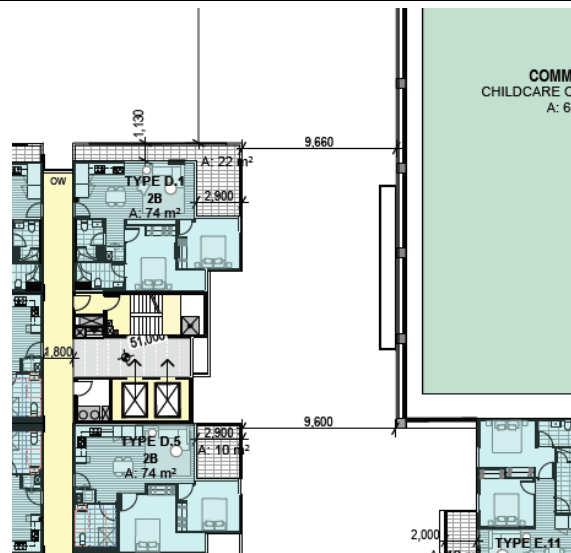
Level 5 central residential apartment and childcare outdoor play area interface.
